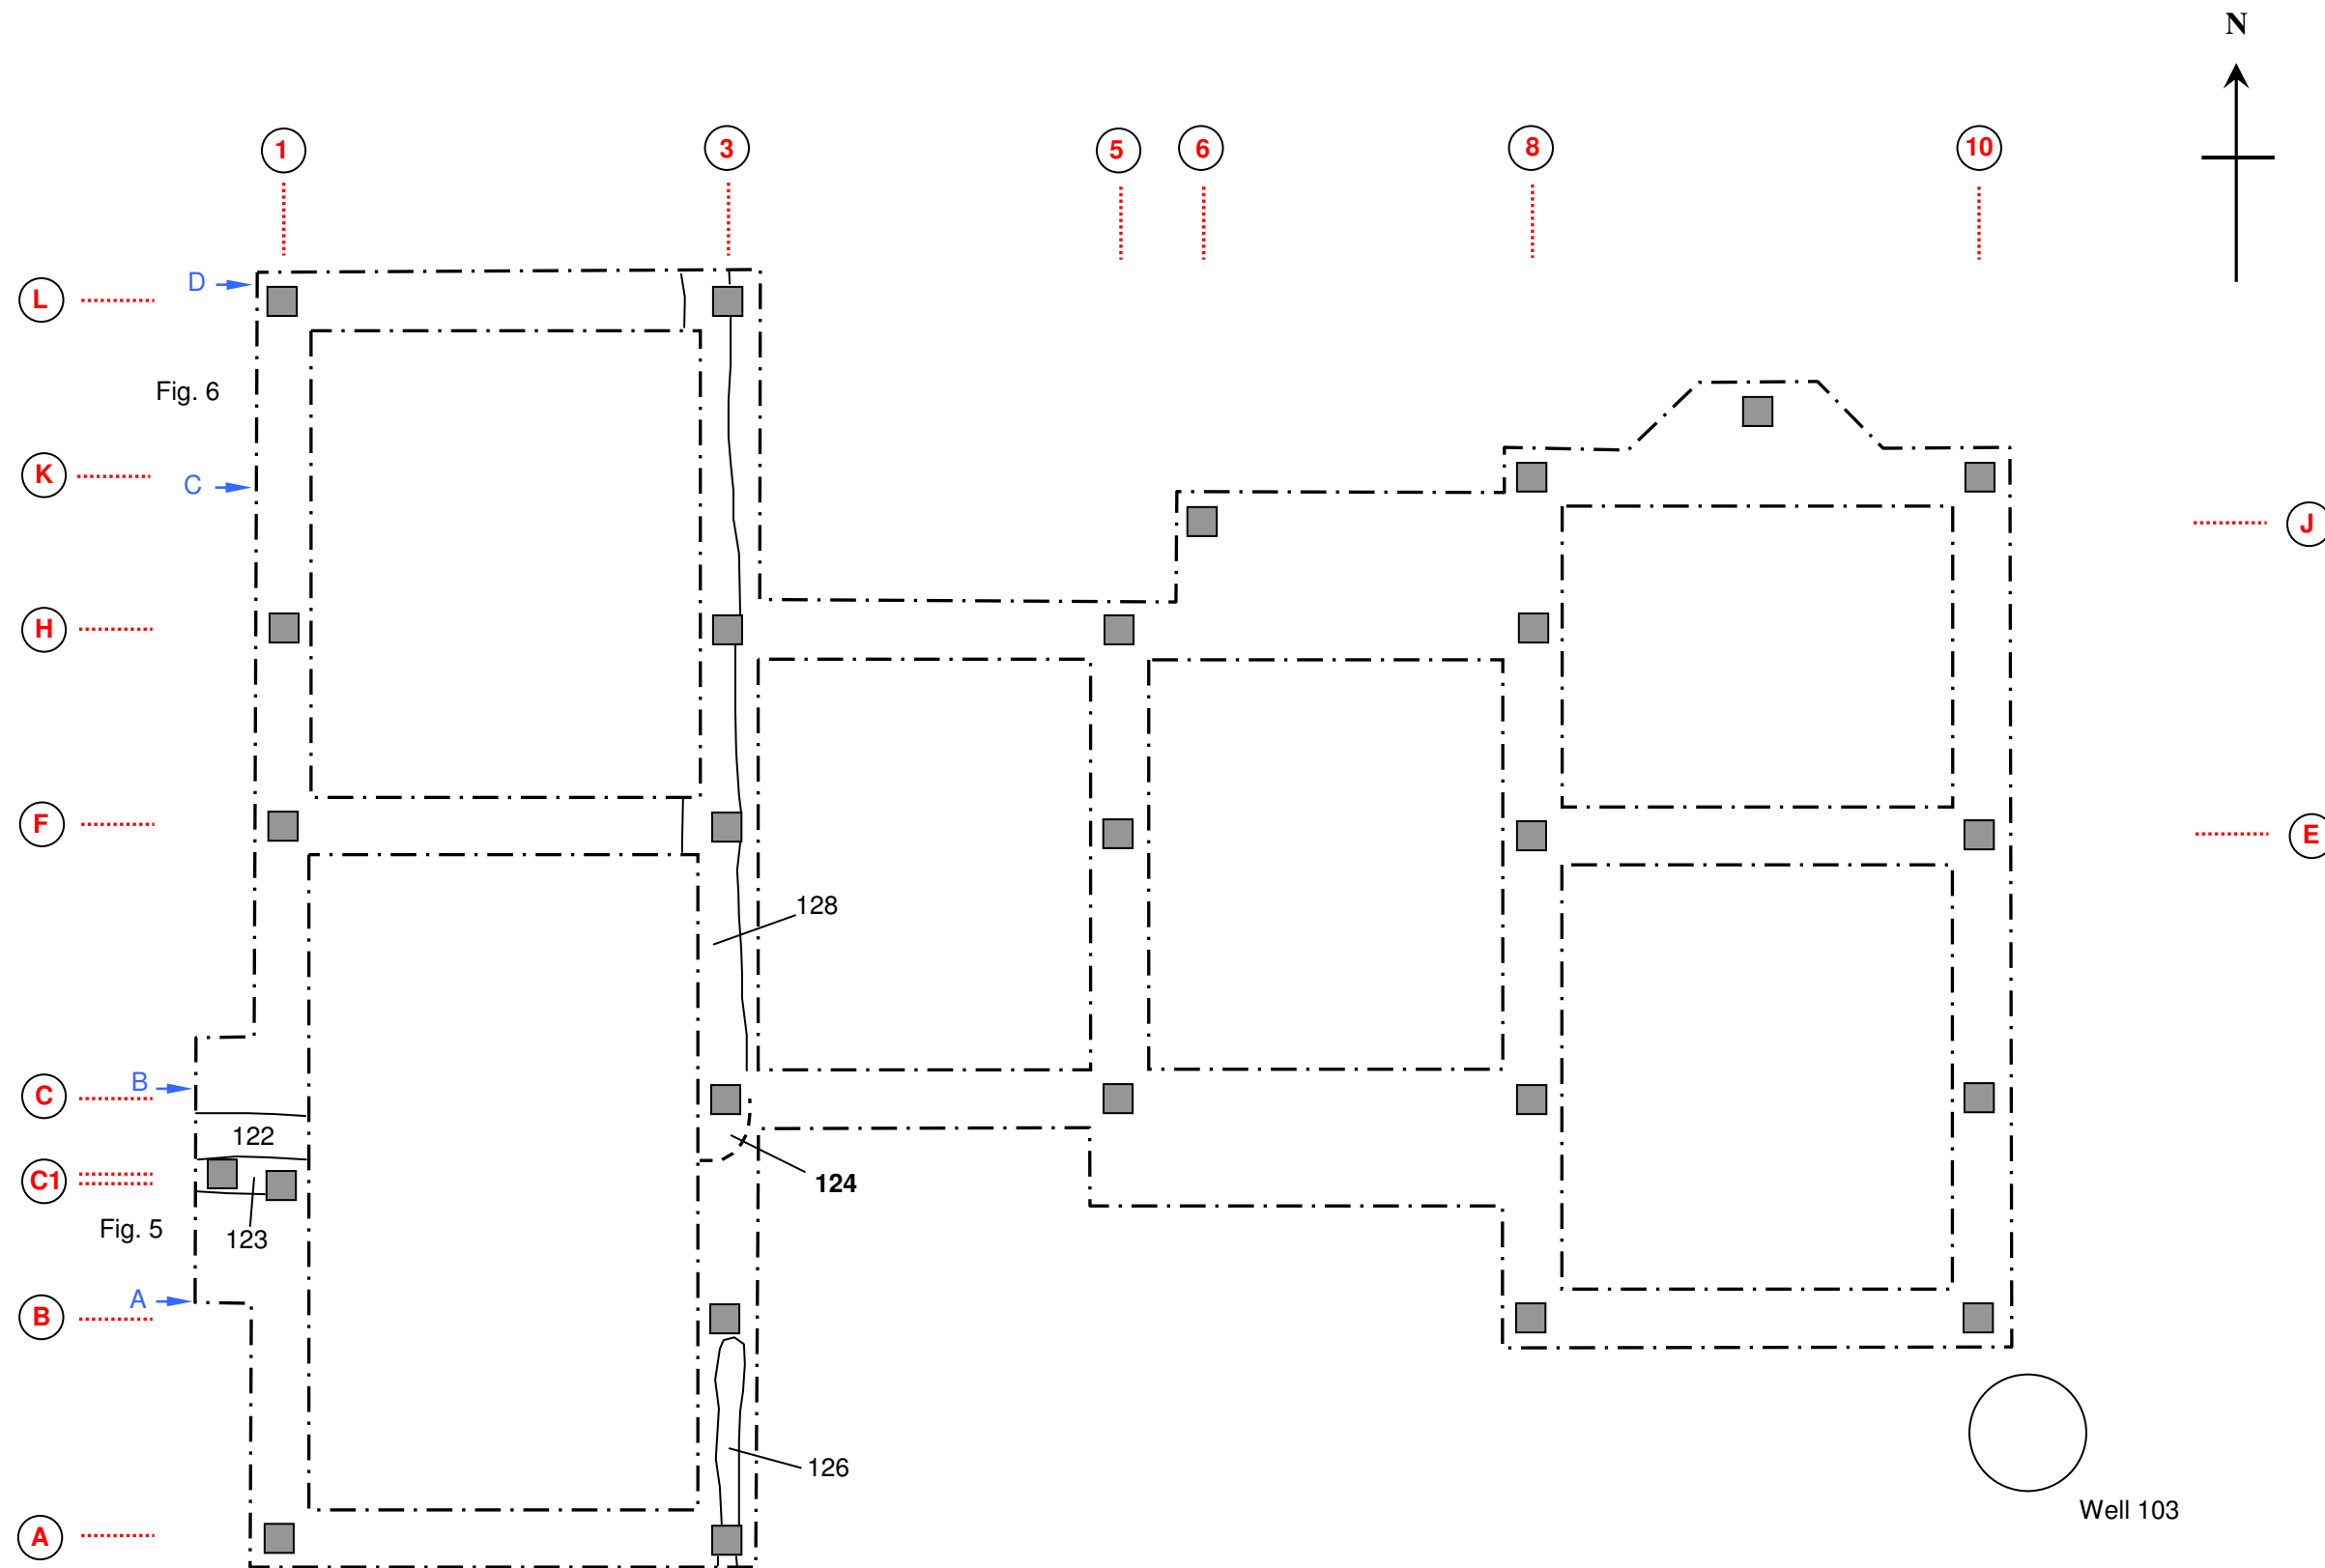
Plan of the ground beam and pile layout of the new building at scale 1:75, showing the locations of section drawings and major archaeological features. The piles are shown in grey and the pile runs are labelled in red.
